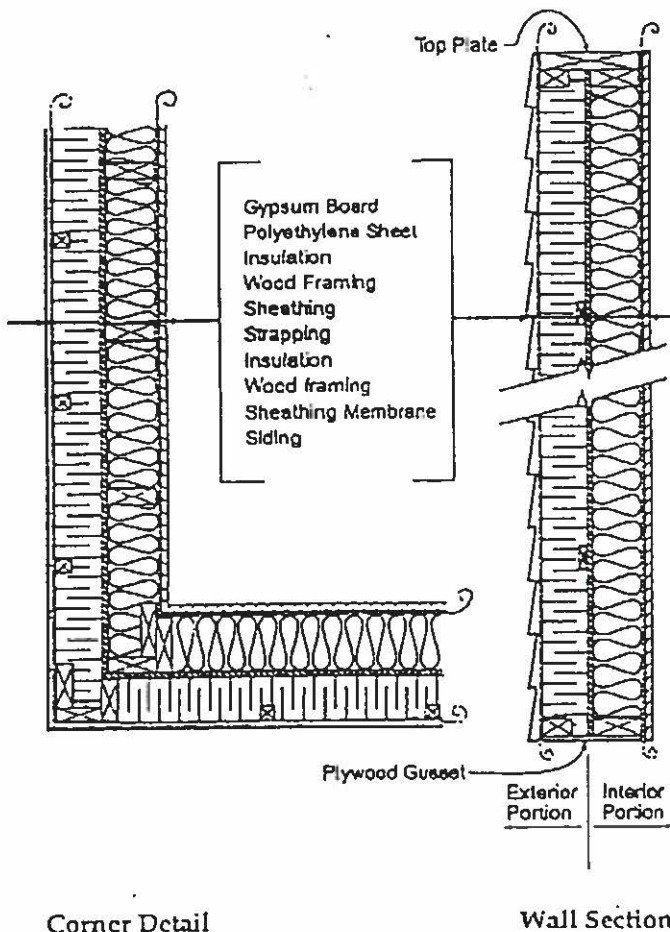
Typical corner detail and wall panel section of "Energy Wall System." (The interior portion is the loadbearing wall.)
